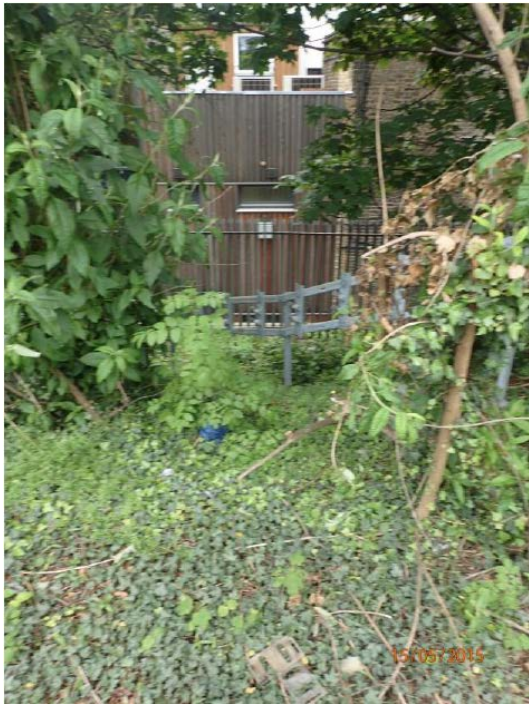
Chainage 675m looking south. Showing cable run aligned downslope of the West Embankment. Taken from Principal Inspection Report of EM4, 15 May 2015.
